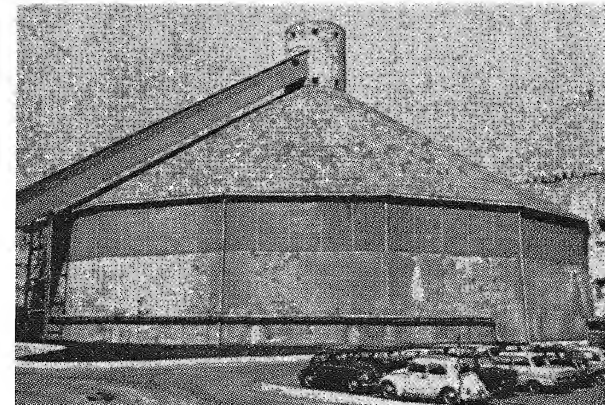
View of the storage building shown in cross-section in Fig. 3 (from Sillem, 1972)
